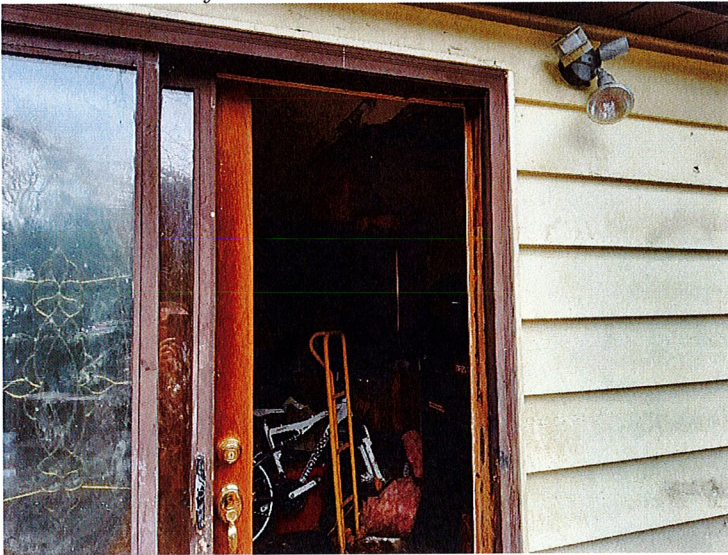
is taken through the open patio door door. You can see the ceiling wall board an insulation falling down.
